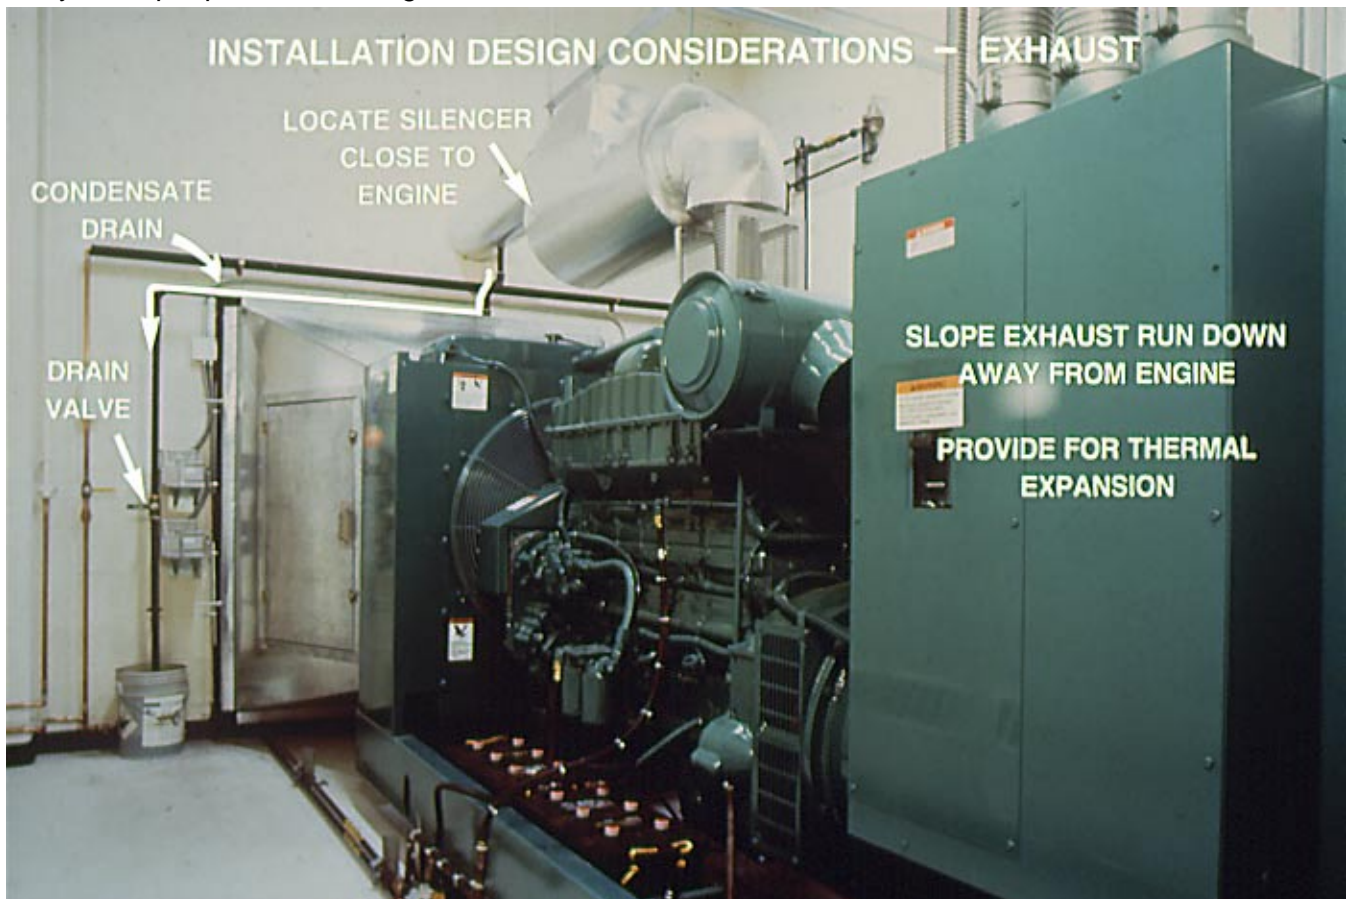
Typical Features of an Exhaust System for a Generator Installed Inside a Building.
